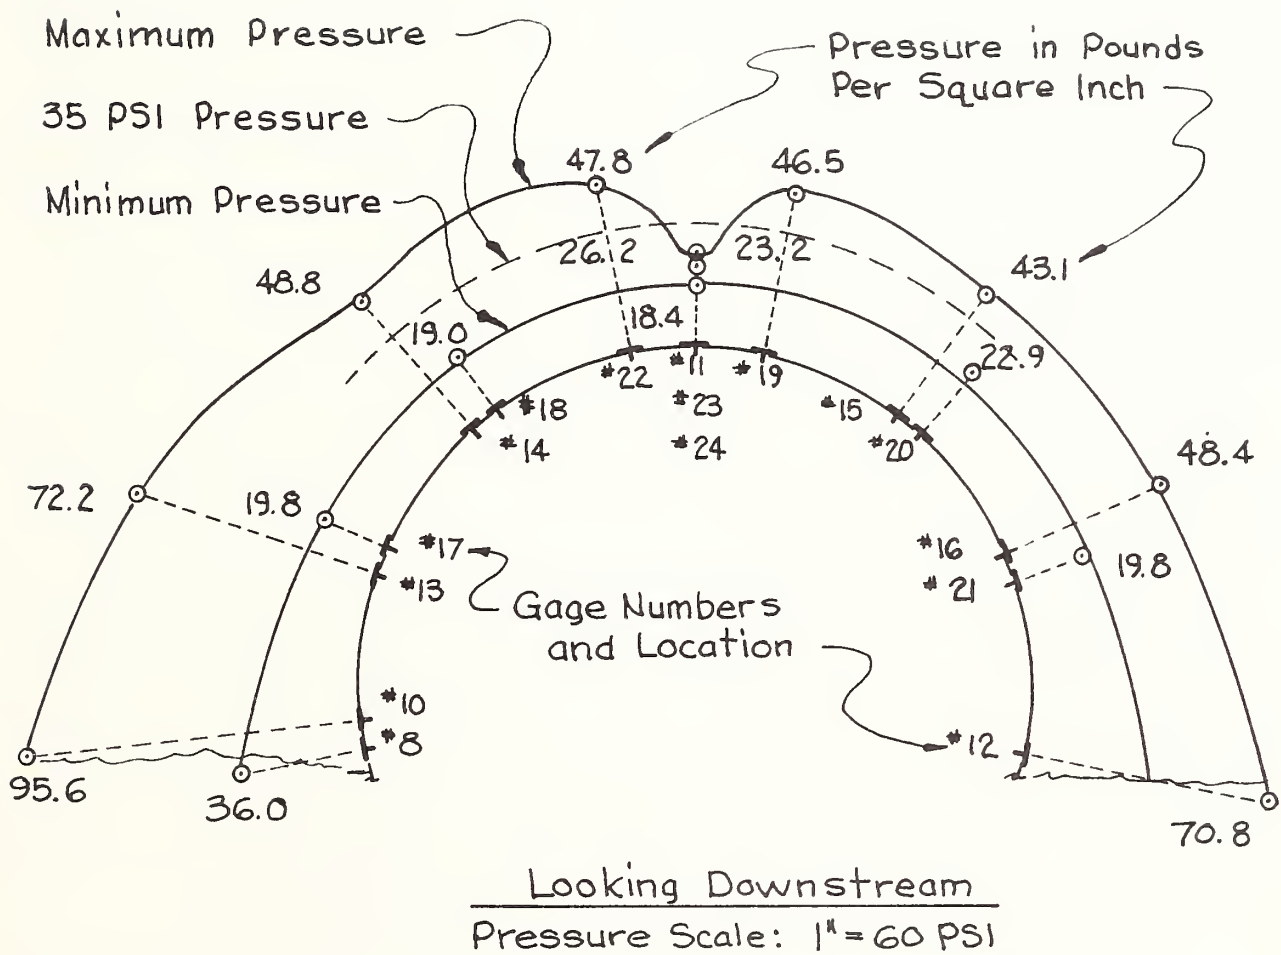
Earth Pressures Acting on the Culvert Walls on 1/4/66
